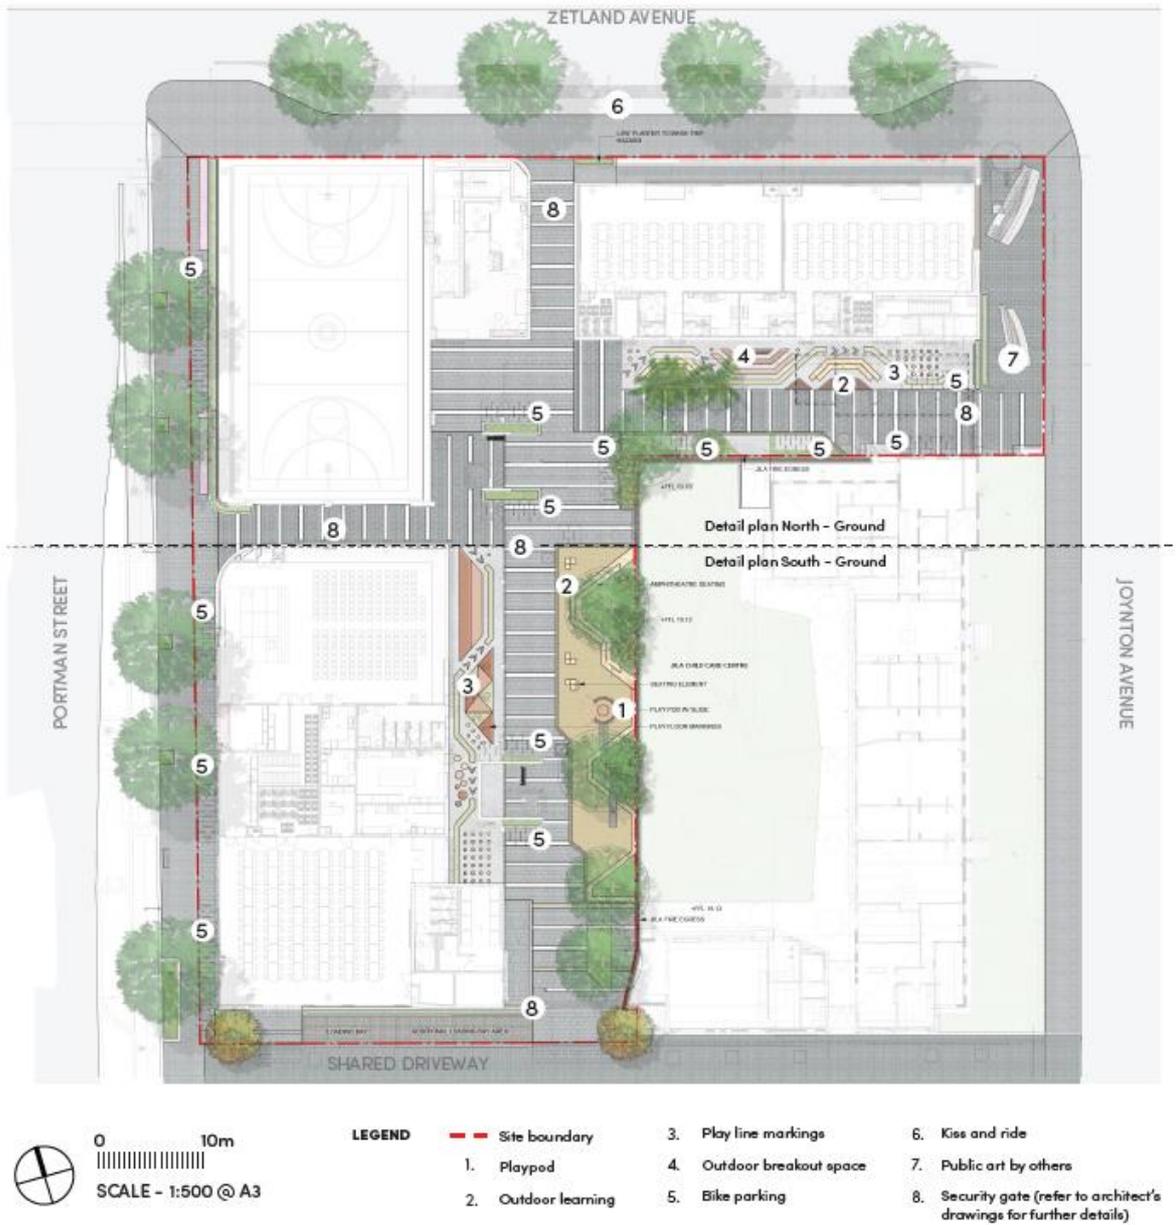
| Landscape – Ground Plan (Source: Turf Design)
